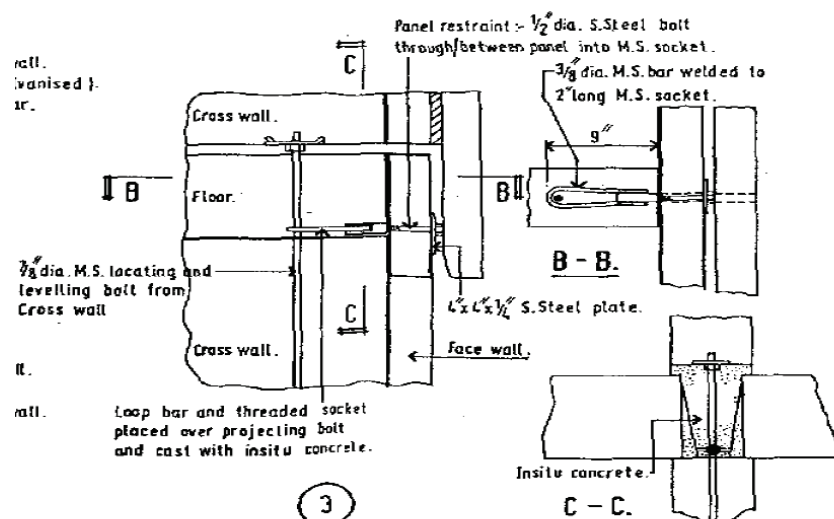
Extract from BRE Report 63. Non-loadbearing cladding panel connection details. (Department of the Environment, 1985)
